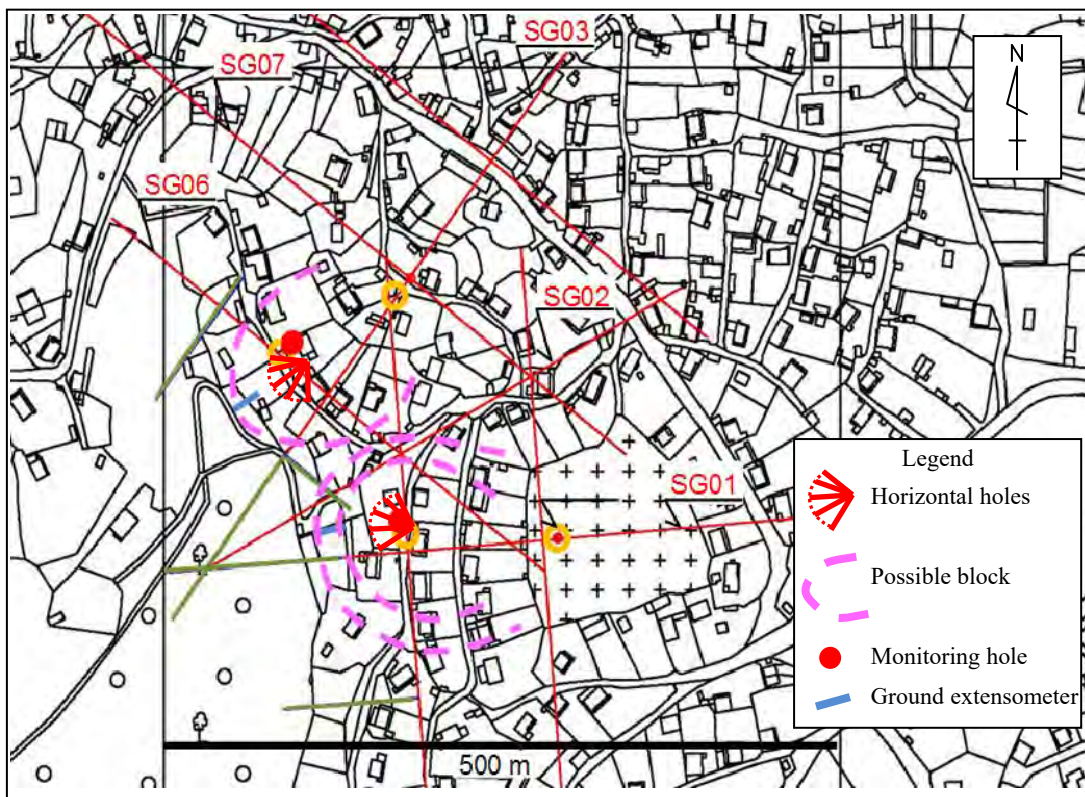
Possible locations of horizontal holes for Getahovit site on a plan
